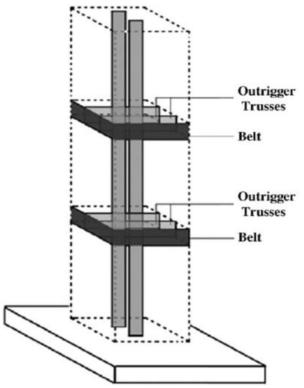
Belt and Outrigger Truss in RC Frame Structure
